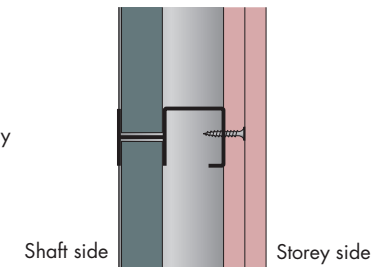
Shaft Wall Deflection Head to Slab Section
